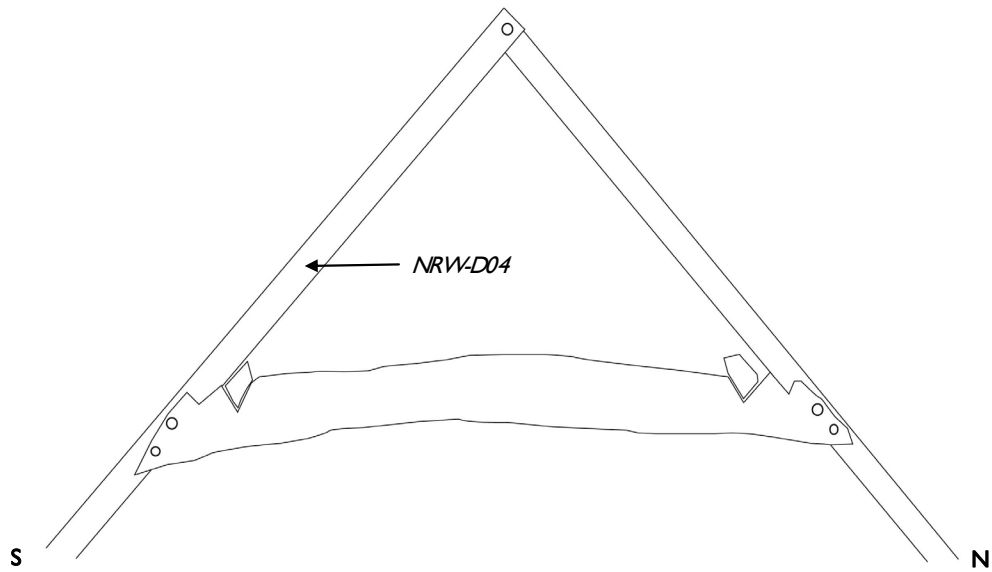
Location of sample on common rafter frame 13, viewed looking west
